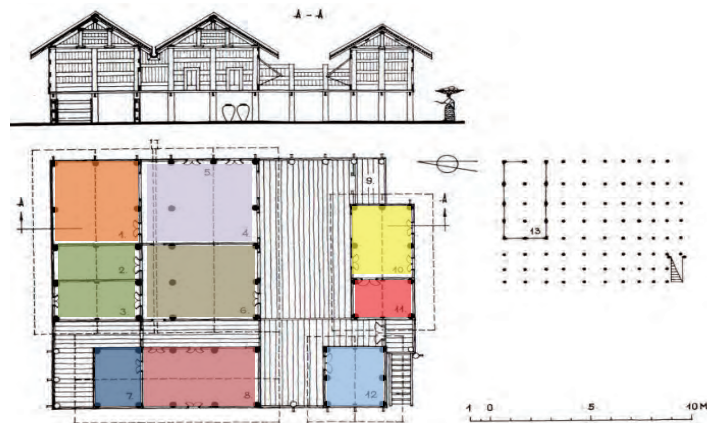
U Kyin Oo's house: Measured drawing elevation and plan of house
